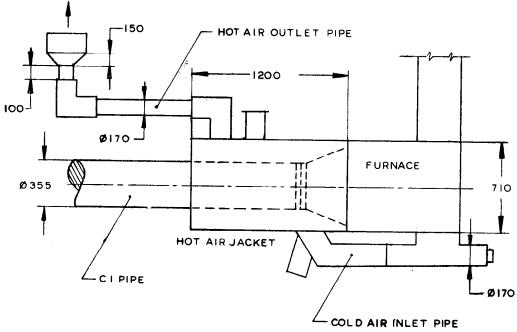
Side Elevation on AD Side (Andhra Barn)
